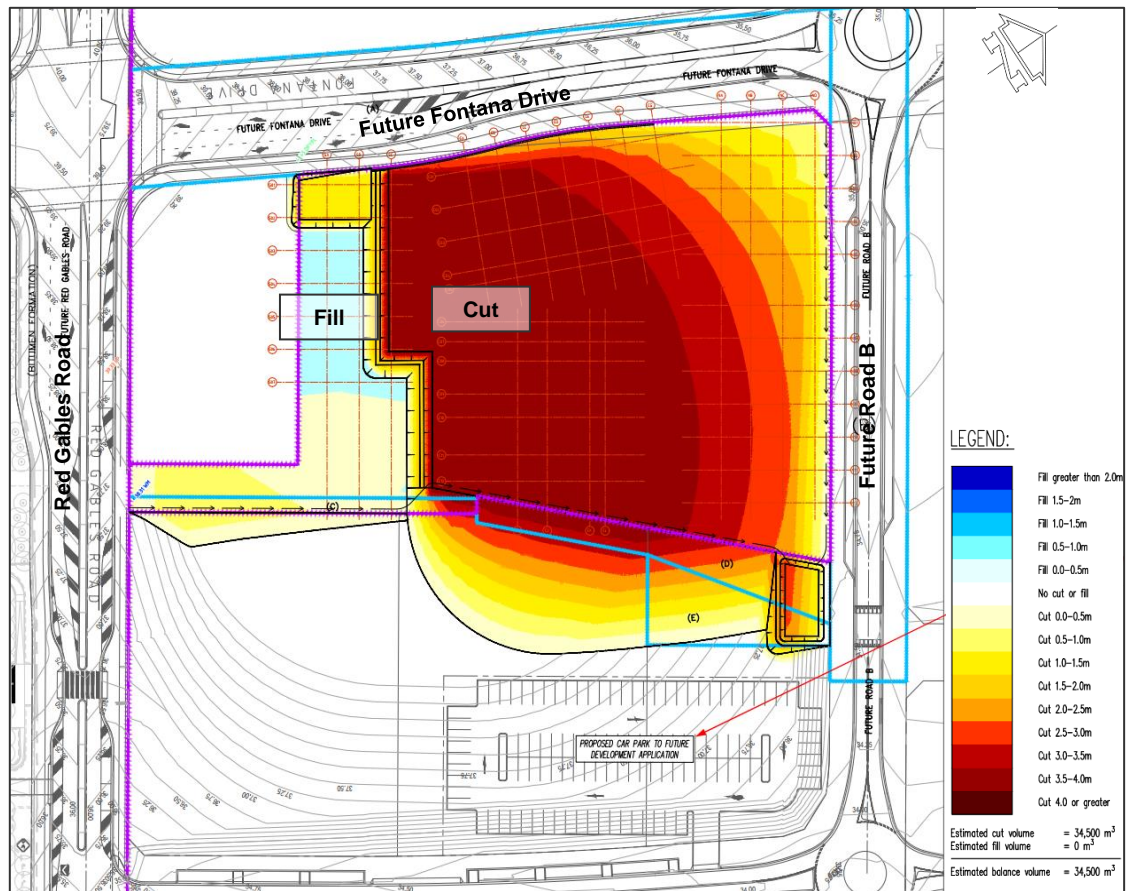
| Approved bulk earthworks DA/1713/2019/HA (Source: Council)
